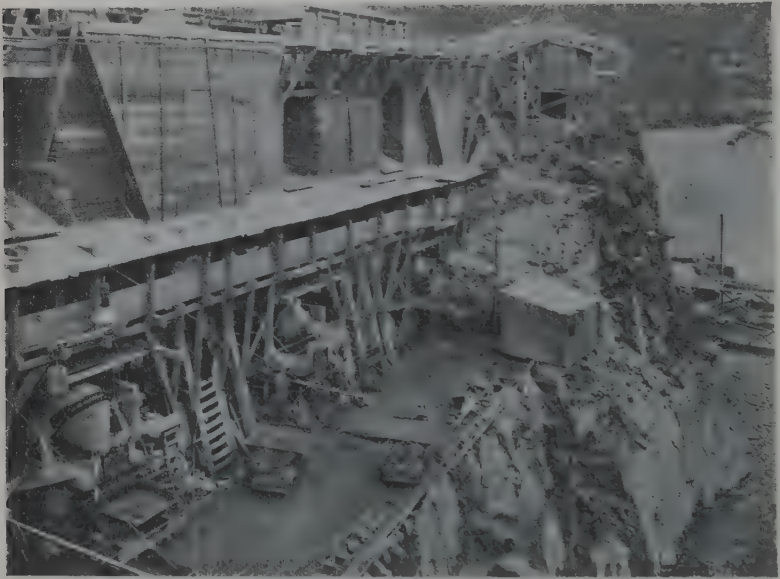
ARROWROCK DAM — CONCRETE PLANT.
